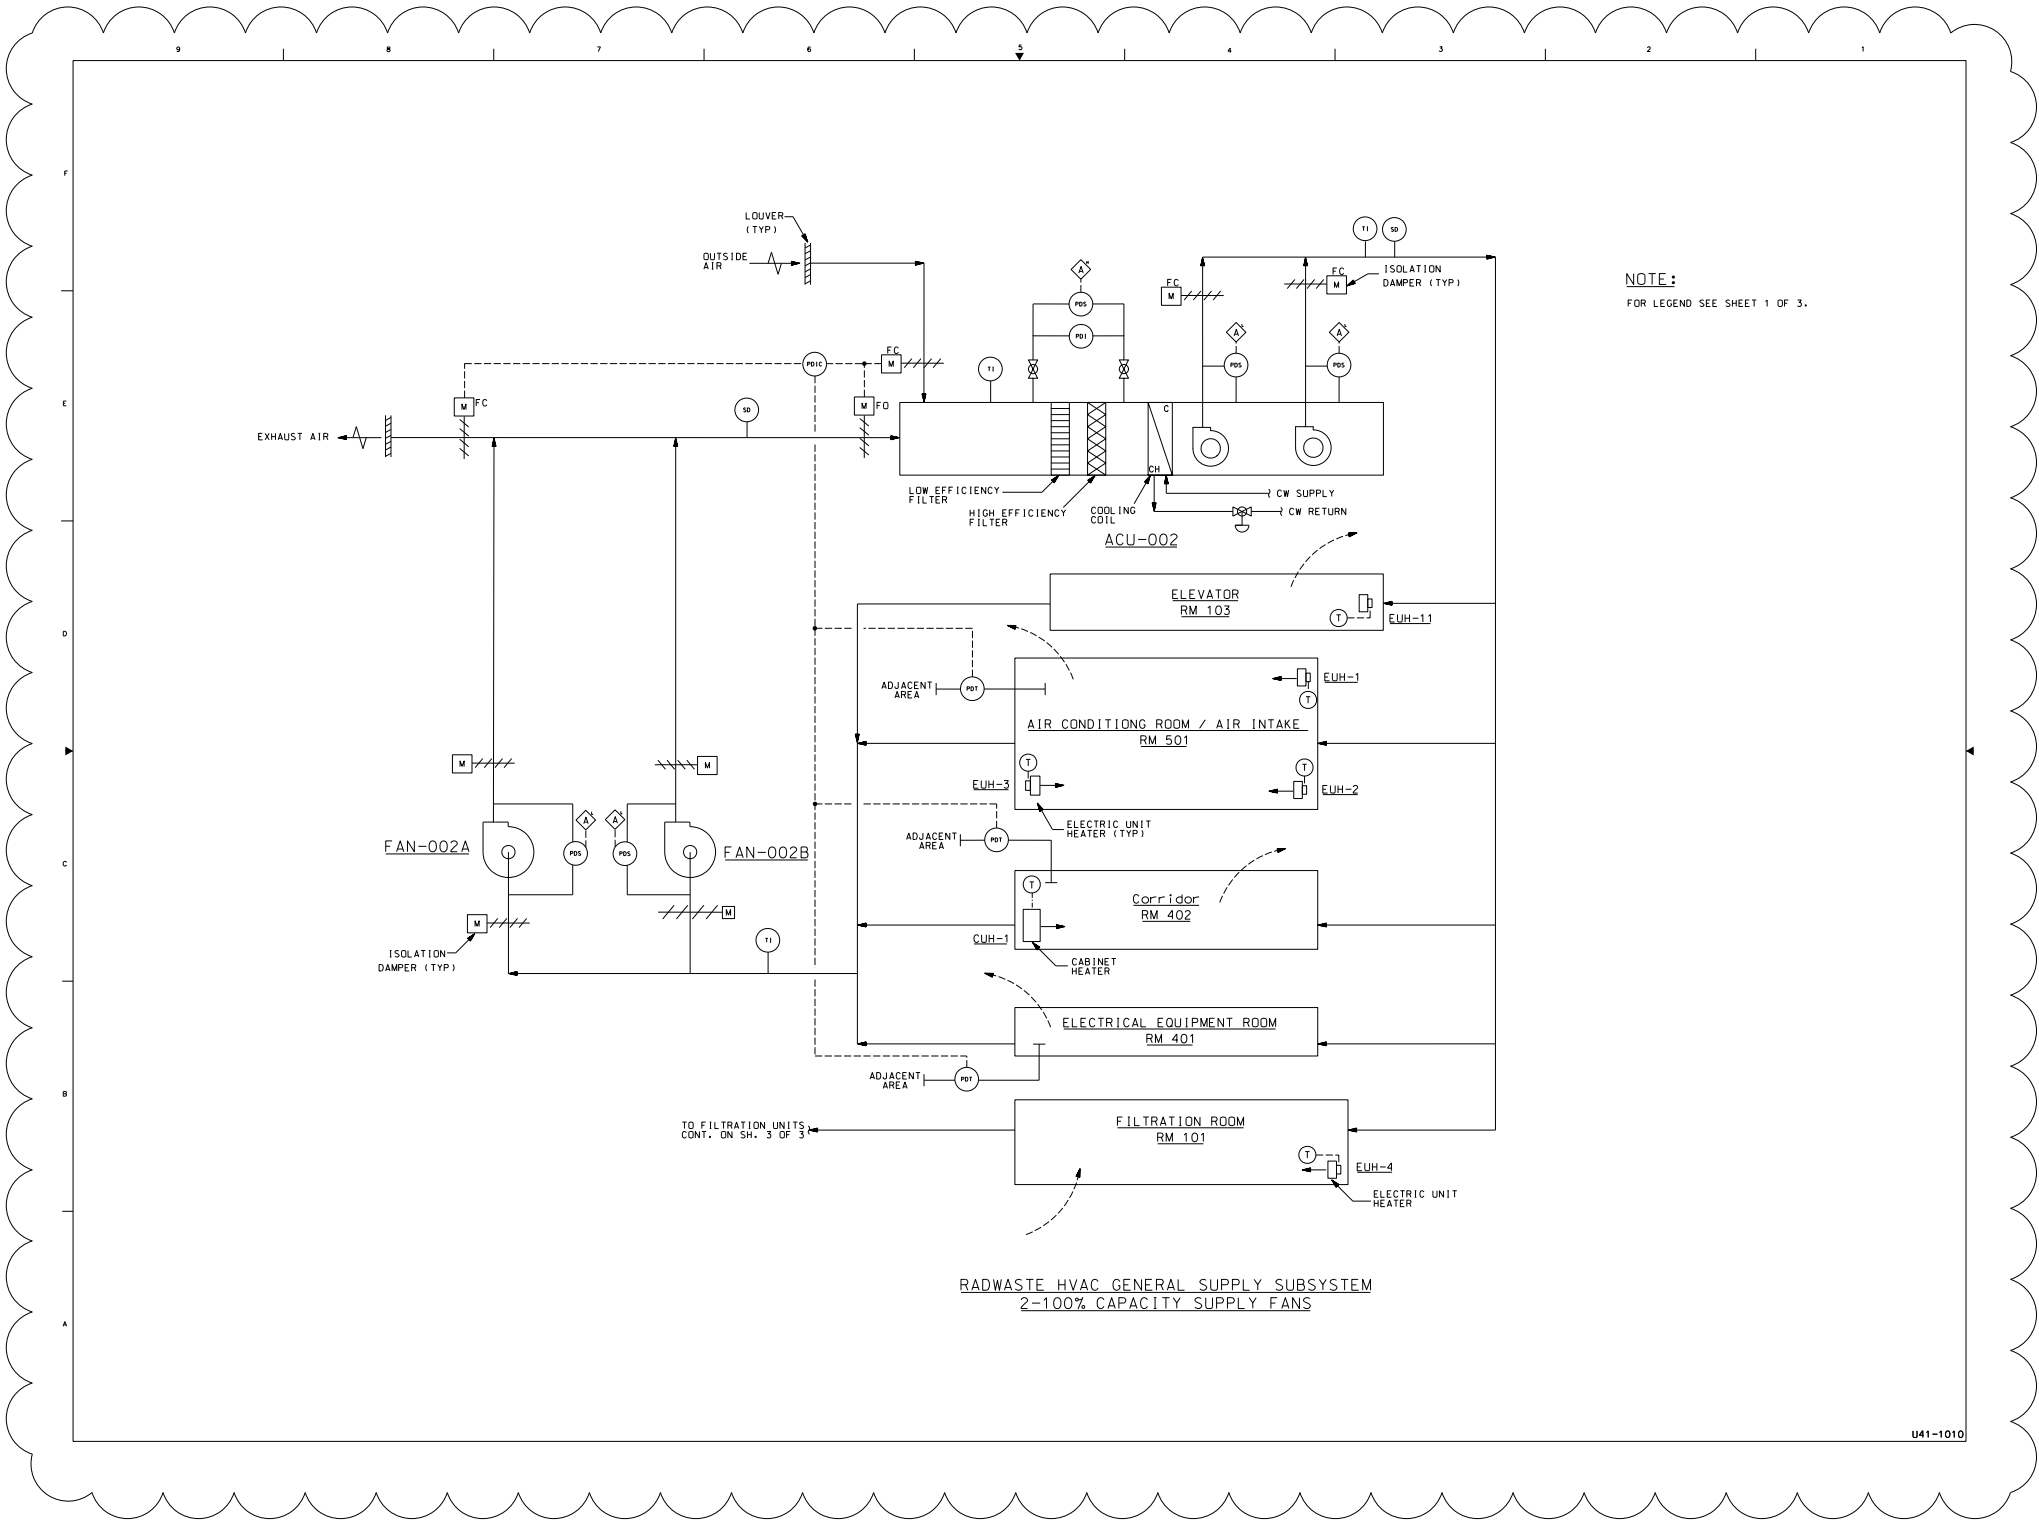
Radwaste Building HVAC P&ID (Sheet 2 of 3)
